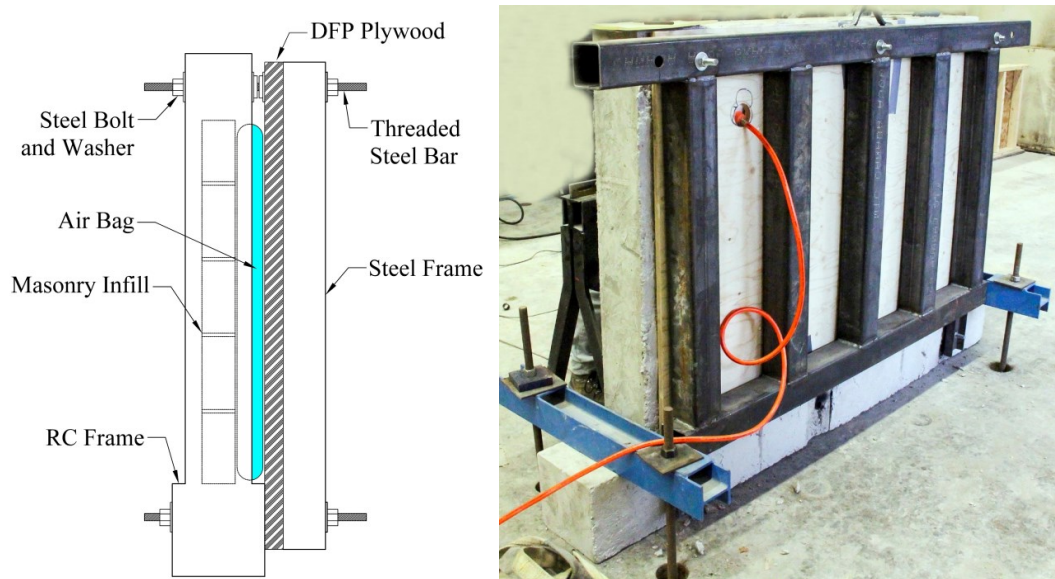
Test set-up for out-of-plane loading of the specimens
